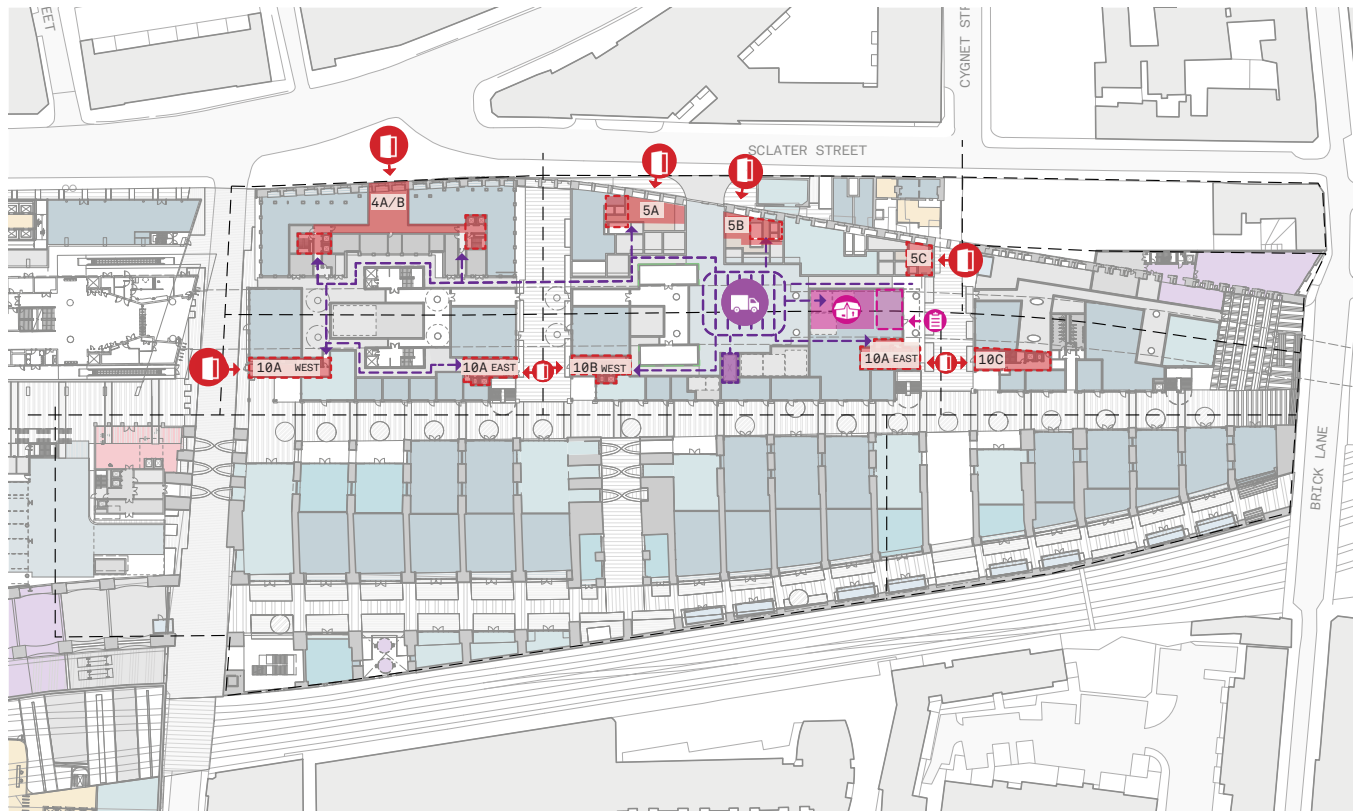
Masterplan ground floor (servicing and access strategy)
